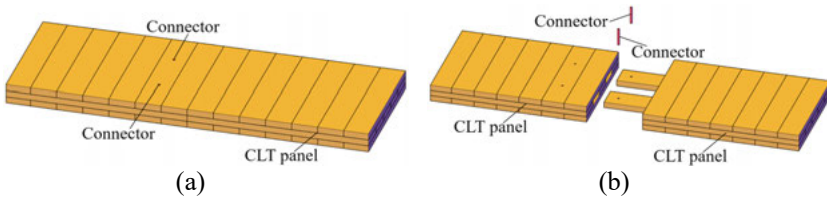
CLT panels with DS connection, (a) jointed view and (b) installation illustration.
